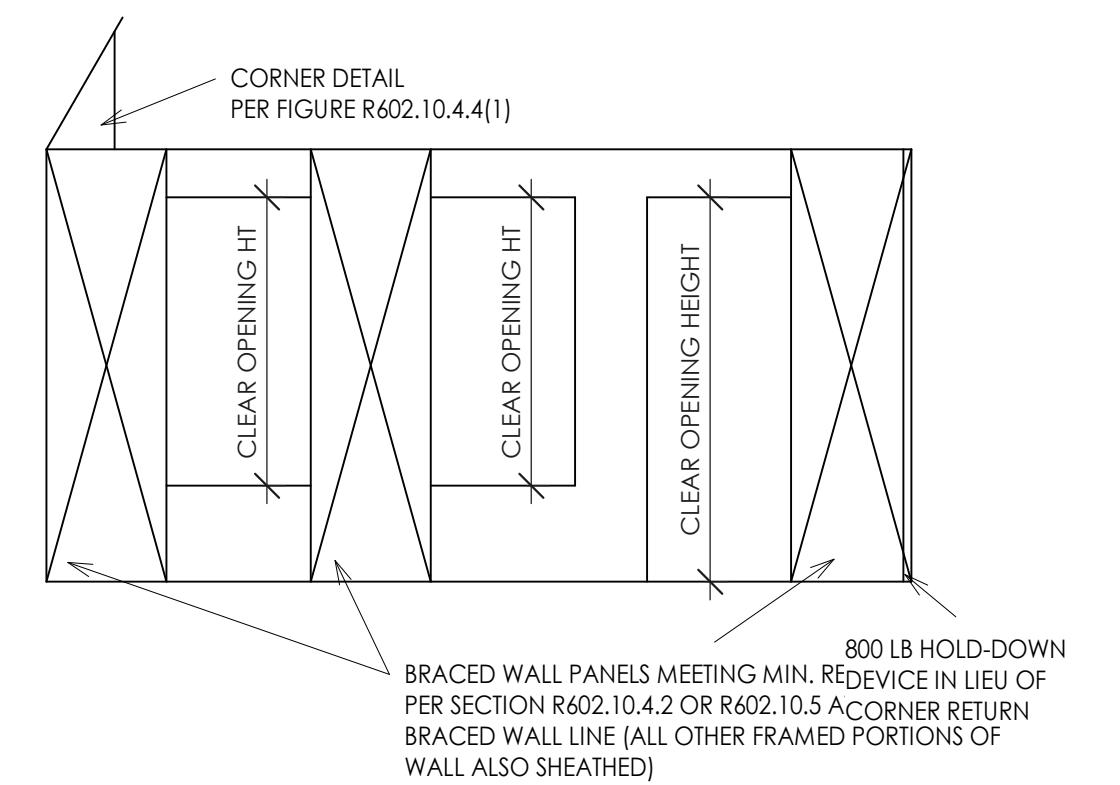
(3) BRACED WALL LINE WITH CONTINUOUS SHEATHING WITHOUT CORNER RETURN PANEL
